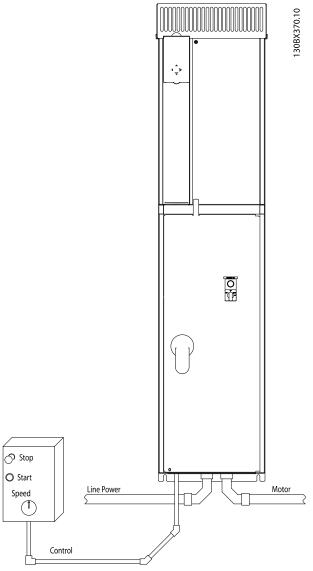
Example of Proper Electrical Installation Using Conduit
